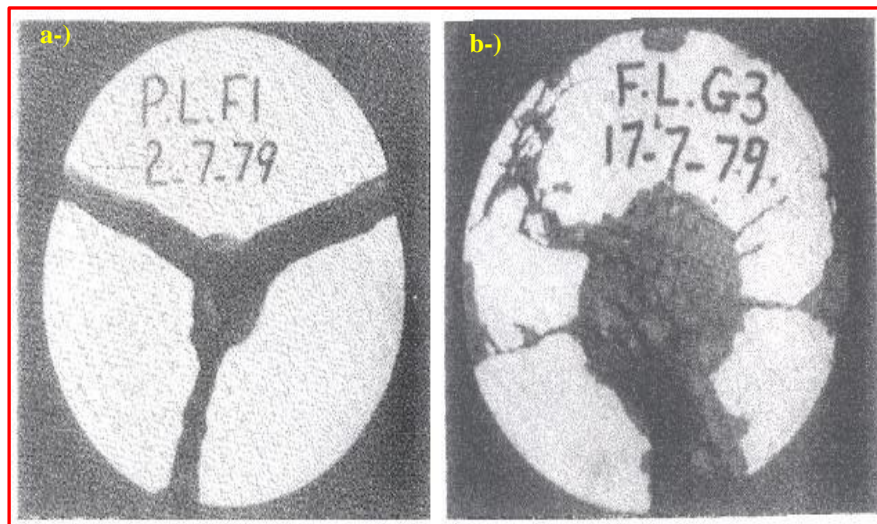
Failure modes of plain and fibre-reinforced lightweight concrete
